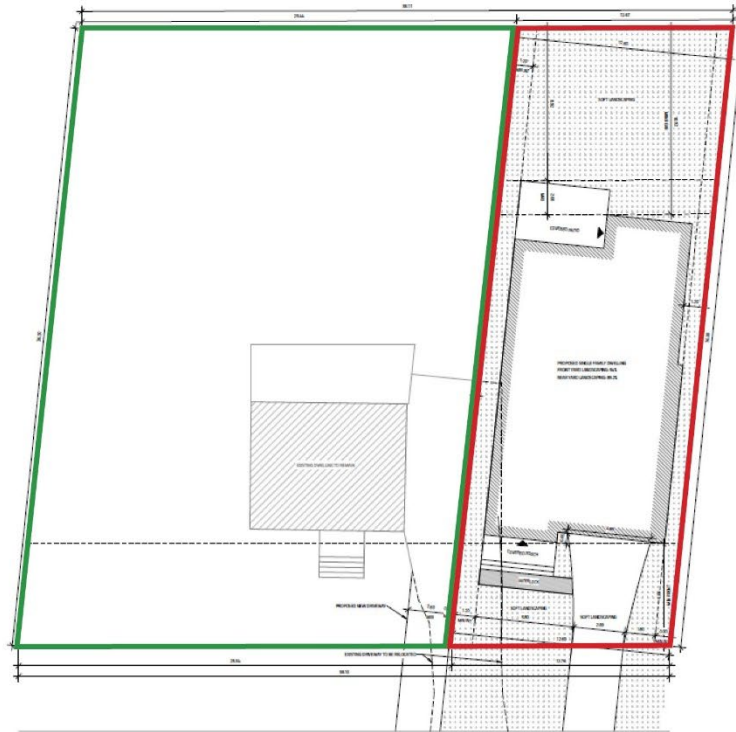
Site Plan sketch illustrating the modified condition to the existing driveway and the concept sketch proposed for the severed lot
